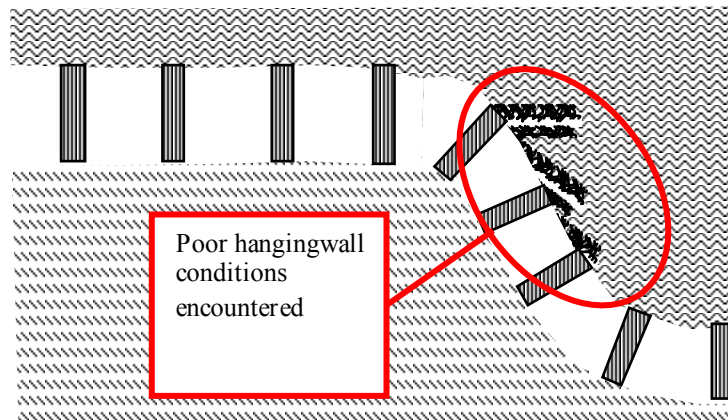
C: Poor hanging wall conditions are encountered in the roll.
